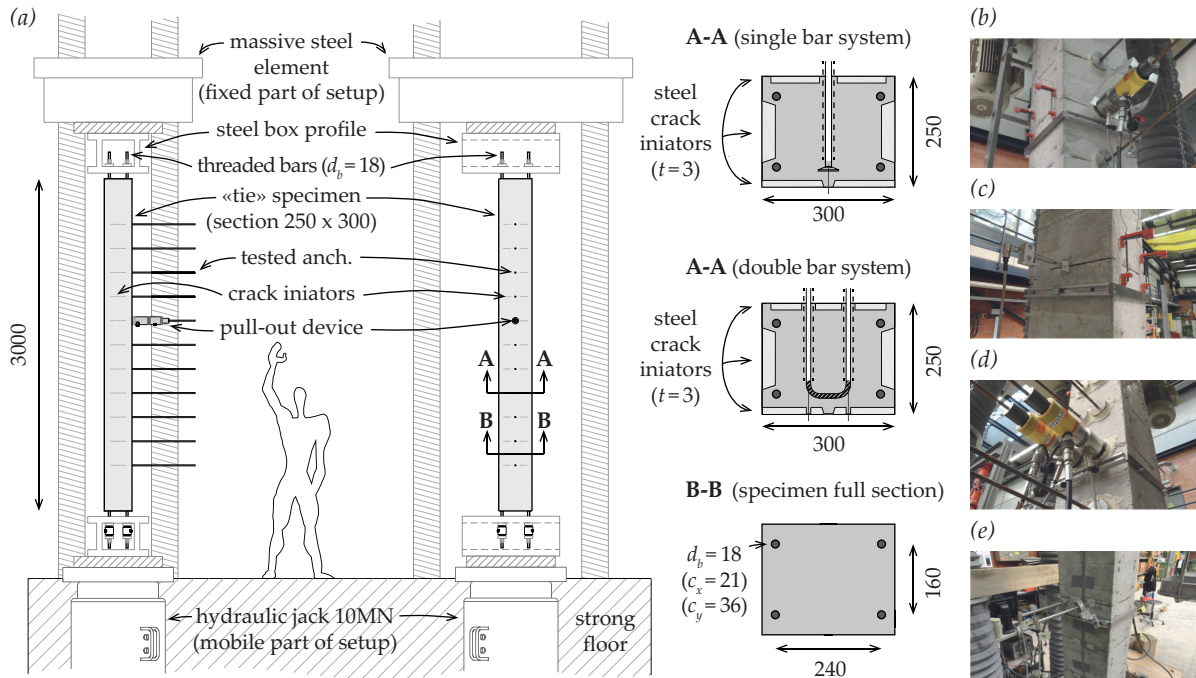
Test setup for the anchorages tested in transverse cracks (concrete specimen under tensile solicitation): (a) detailed plans and description (dimensions in [mm]); test and measurement devices for (b-c) simple system and (d-e) double system (U-shaped bars only)
